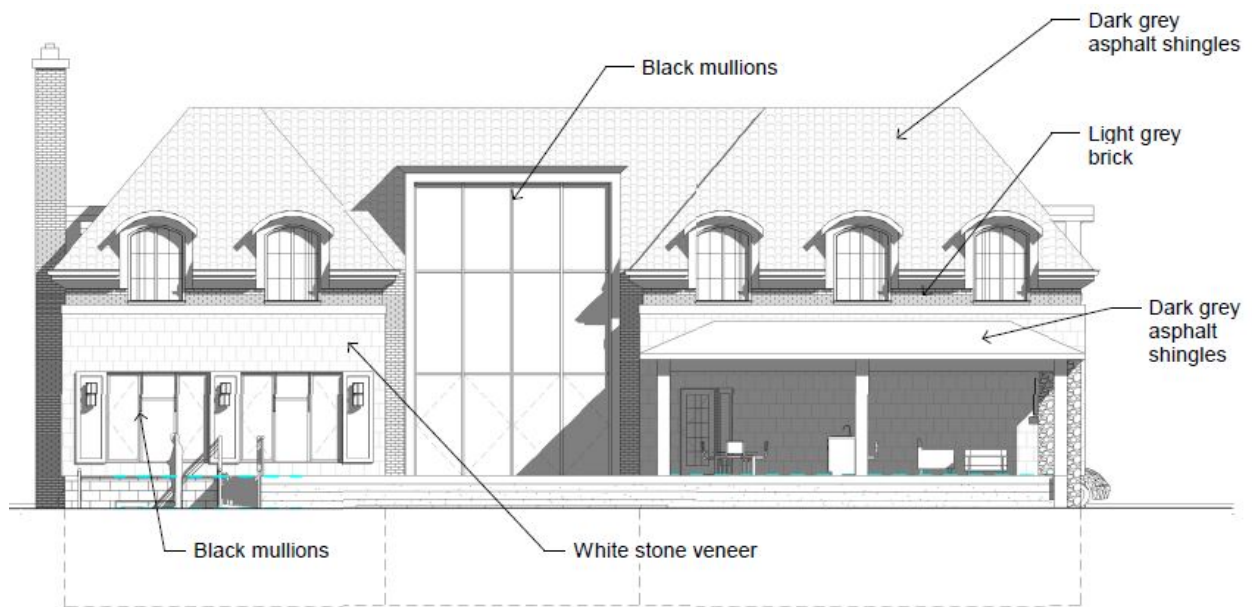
East Elevation, 2230 Mississauga Road. (Image from client.)
